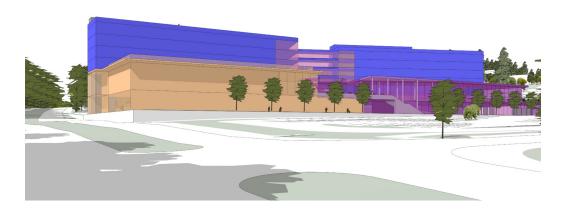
VIEW LOOKING NORTHWEST FROM ROSSOW
